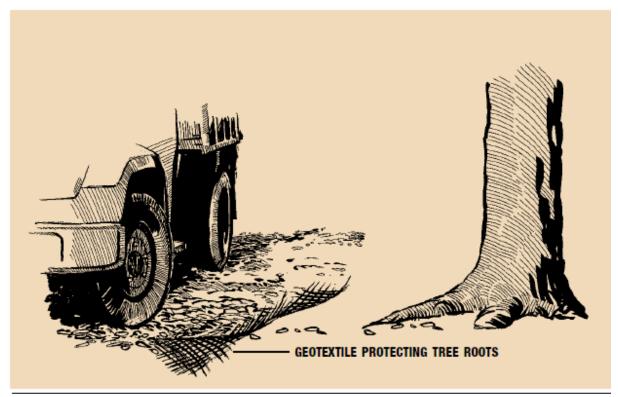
Two to 4 inches of mulch placed on a geotextile sheet protects soils from compaction caused by construction equipment and material storage.
